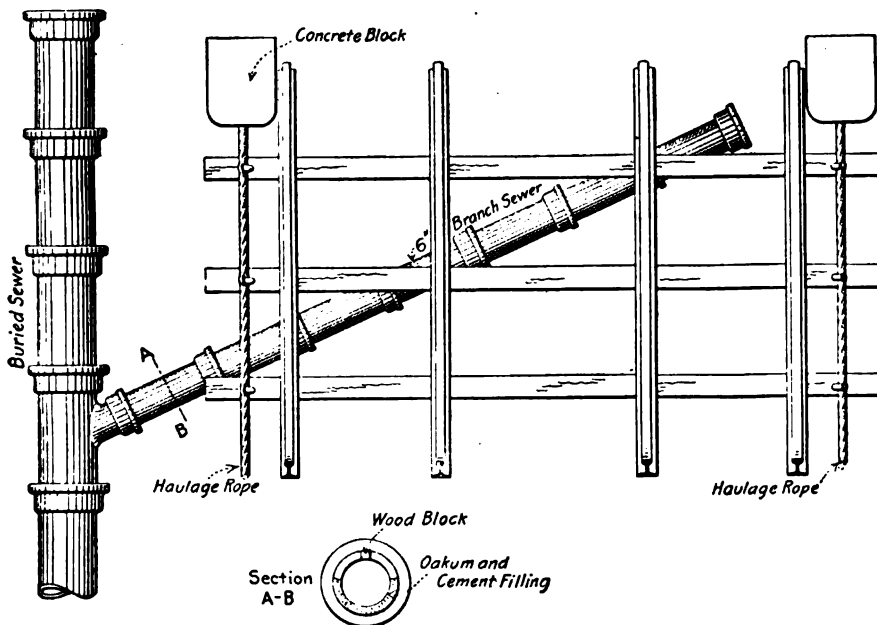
DRAINING A GRAVITY PLANE WITH SEWER PIPE.
